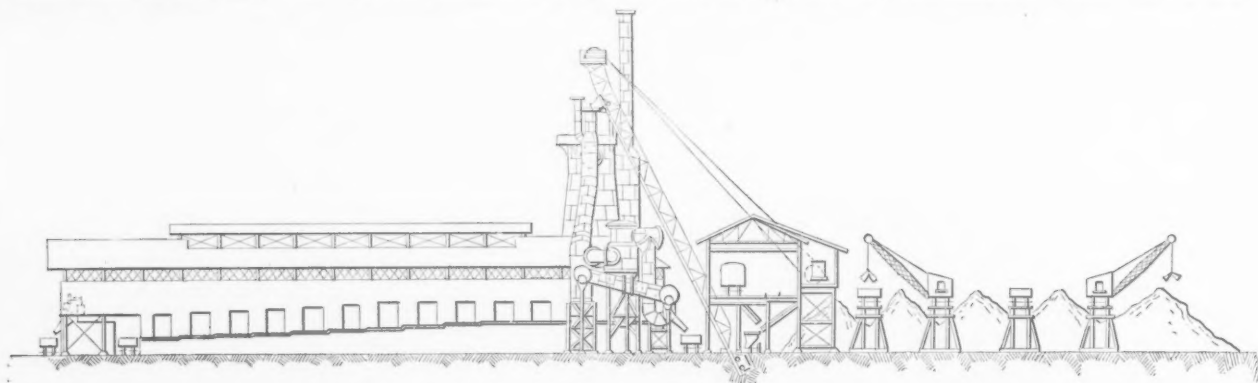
Elevation, Part in Section, of Ore Stock Piles, Bins, Blast Furnace and Cast House of the Hamilton Steel & Iron Company, Hamilton, Ontario.
